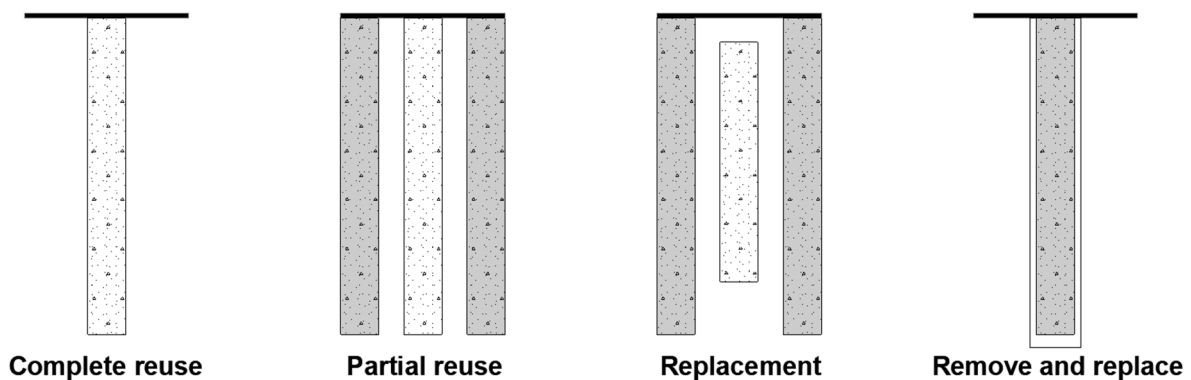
Four options when building on a site with existing pile foundation. (Illustration based on source nr. 44)
